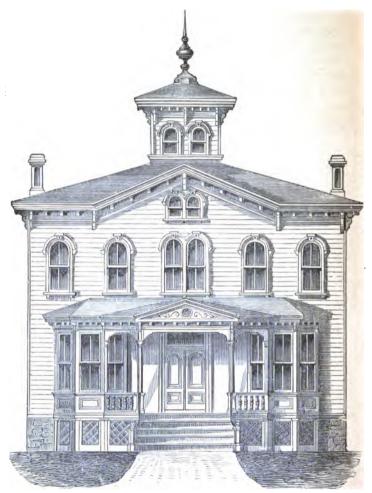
ELEVATION OF FRONT OF HOUSE.
